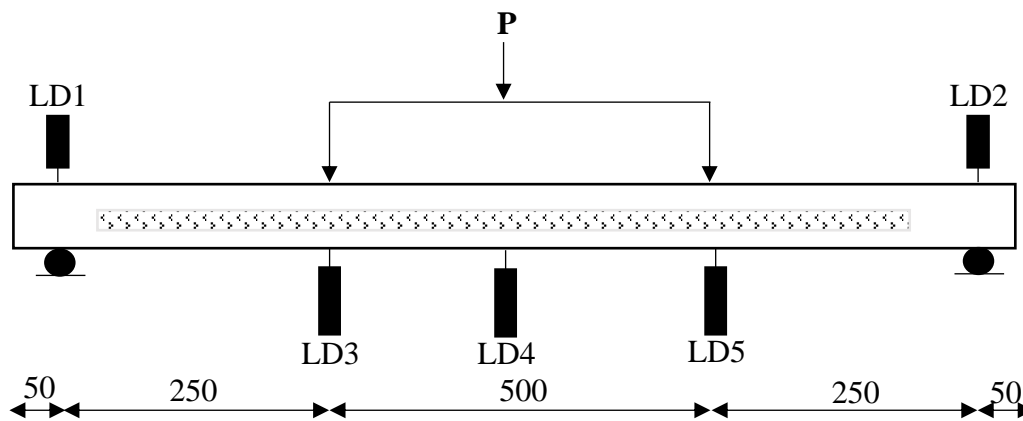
Instrumentation: Arrangement of LVDTs for specimen
